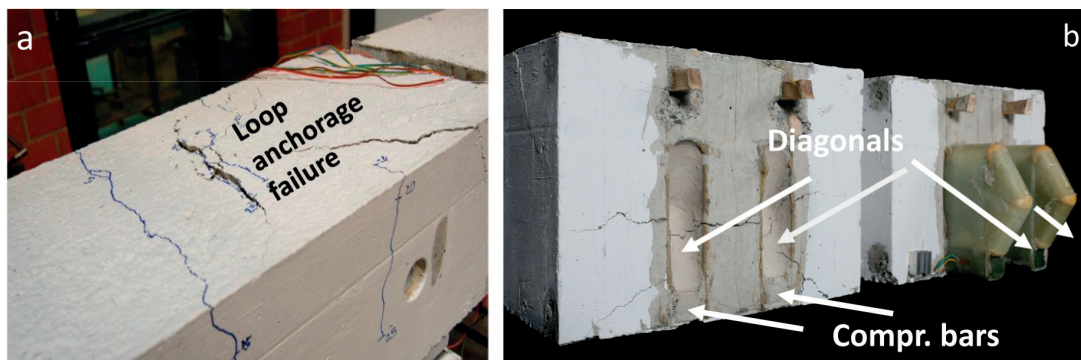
Failure mode of beam G600: a) top concrete failure in loop anchorage zone, b) cracks through the hexagon diagonals' support area of interior (left) beam, undamaged hexagons in cantilever (right) beam.
